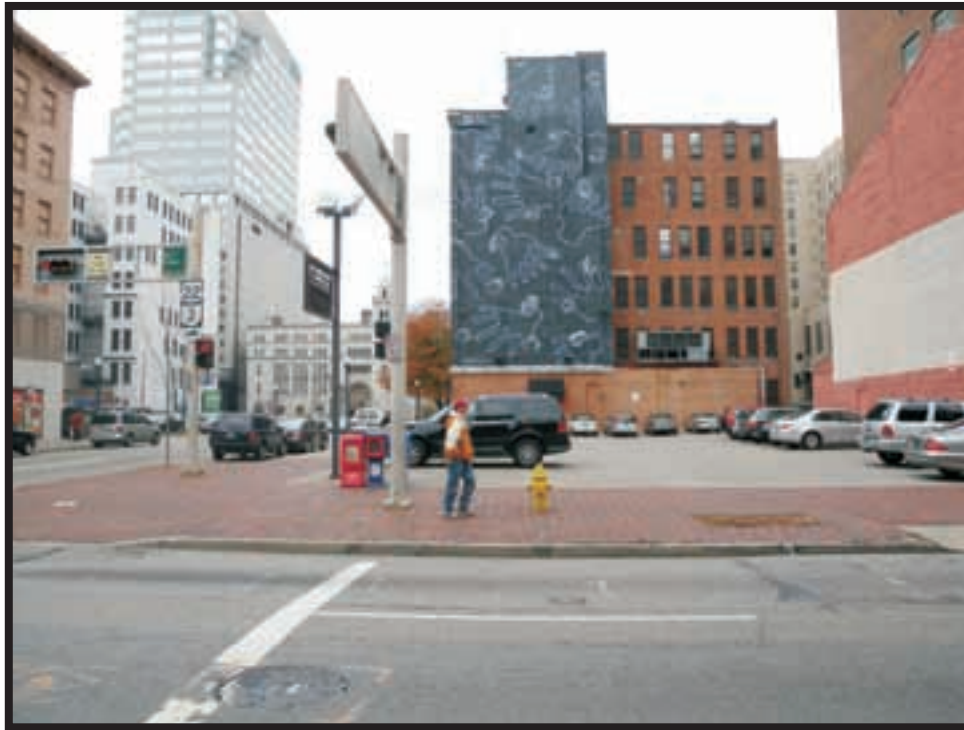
View of Proposed Streetcar Stop Location 4 at the northwest corner of the Eighth and Main Street intersection, facing west.
